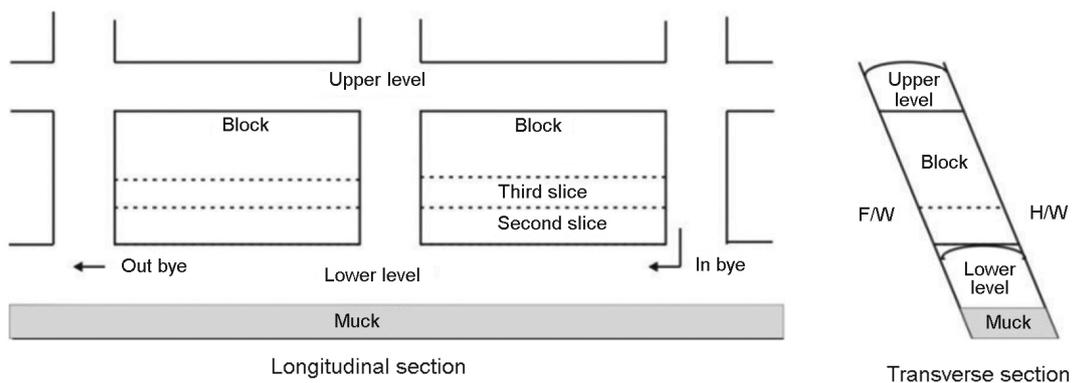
Longitudinal and transverse sections showing the first stage of stope with filling.
